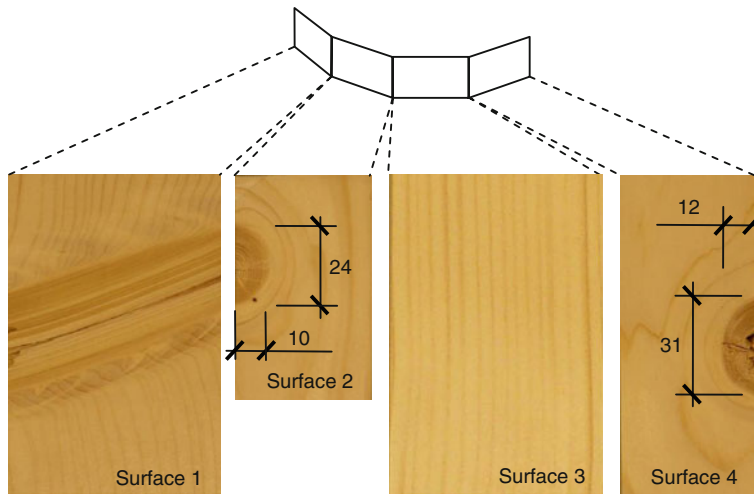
Knot dimensions (mm) in Edge knot specimen
